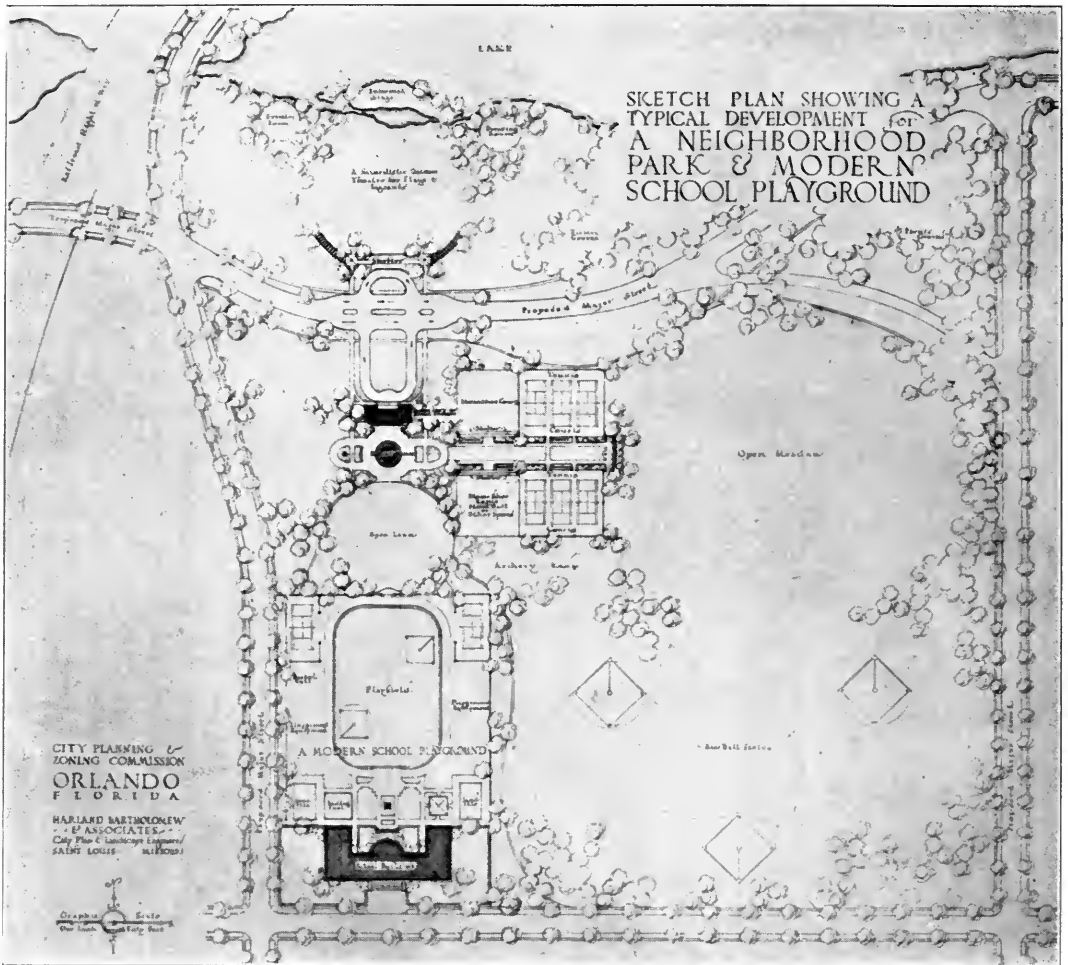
SKETCH PLAN SHOWING TYPICAL DEVELOPMENT FOR A NEIGHBORHOOD PLAYFIELD-PARK AND MODERN SCHOOL PLAYGROUND
